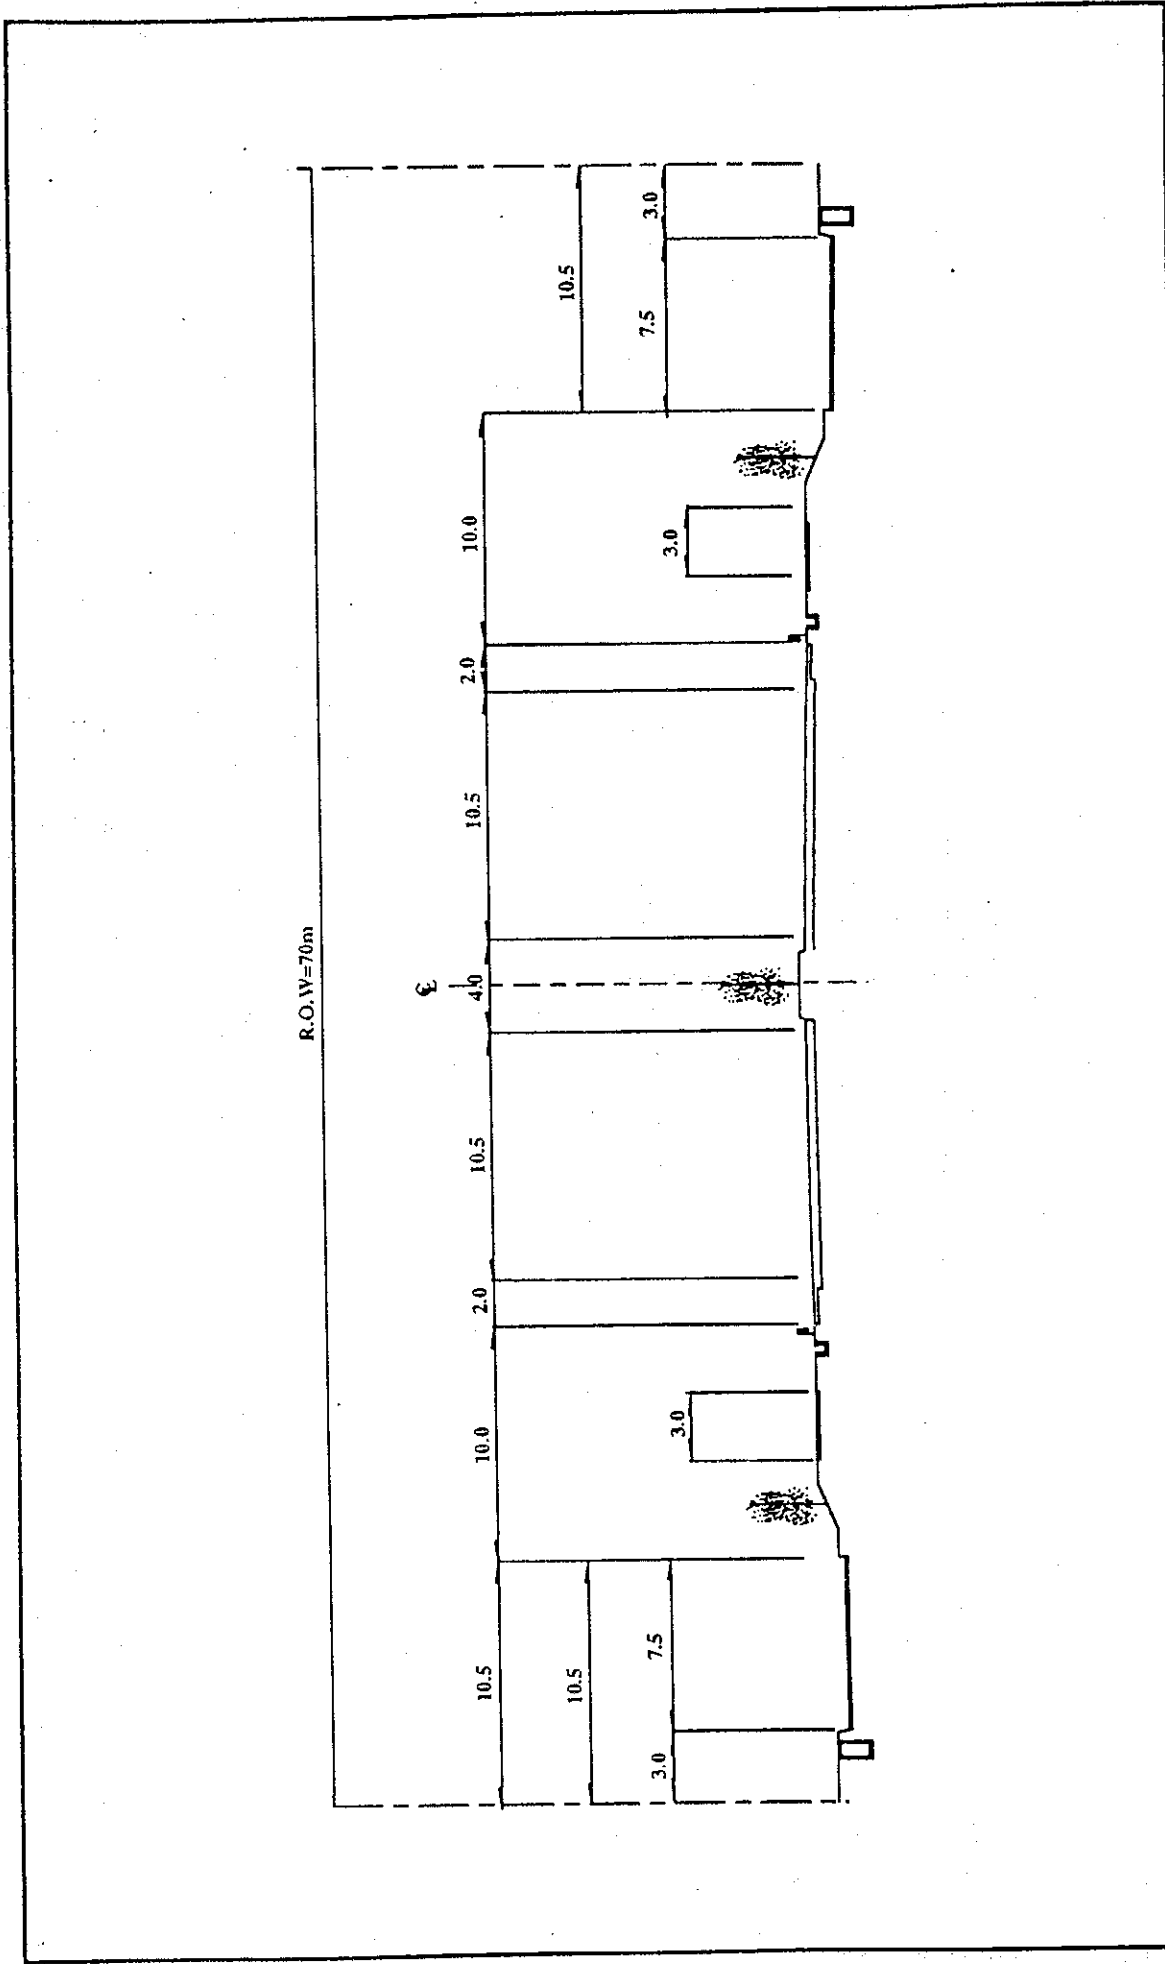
Typical Cross Section for the North - South Axis (6-lane, Double Deck with Ricket Type Pier)
